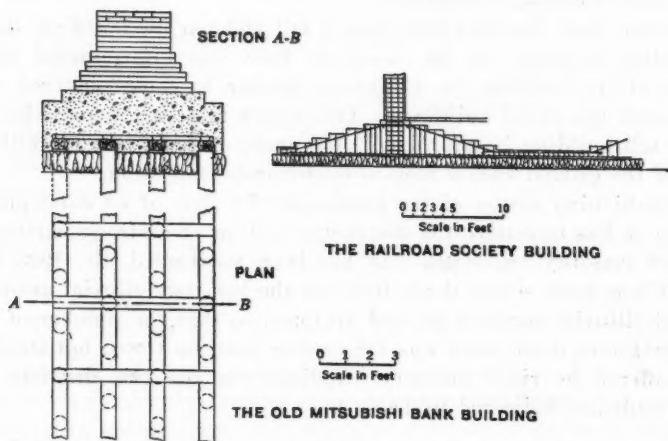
FLOATING FOUNDATION OF RAILROAD SOCIETY BUILDING.
